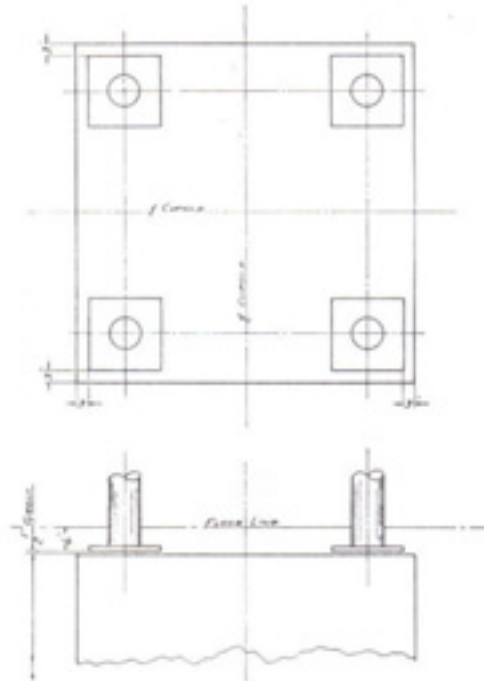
Diagram of concrete foundation (depth of concrete to suit condition of soil).
